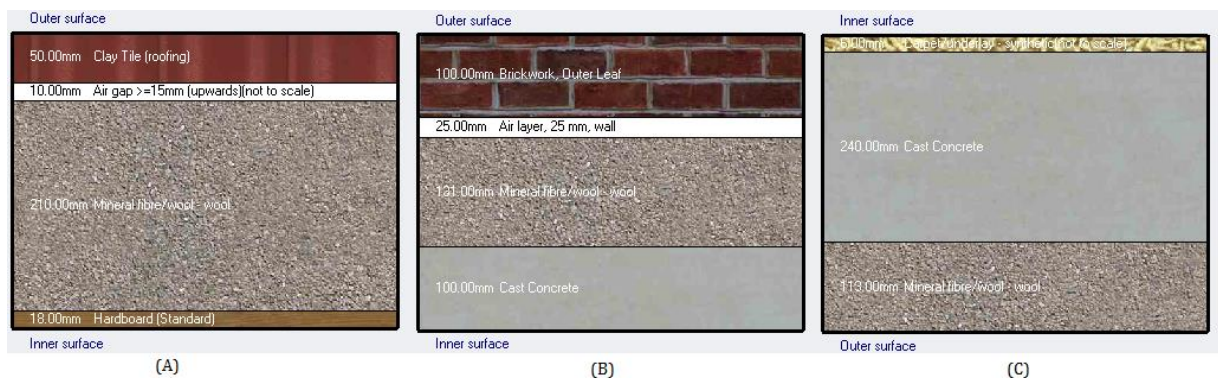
Detail of the layering (a) roof (b) facade (c) ground floor
